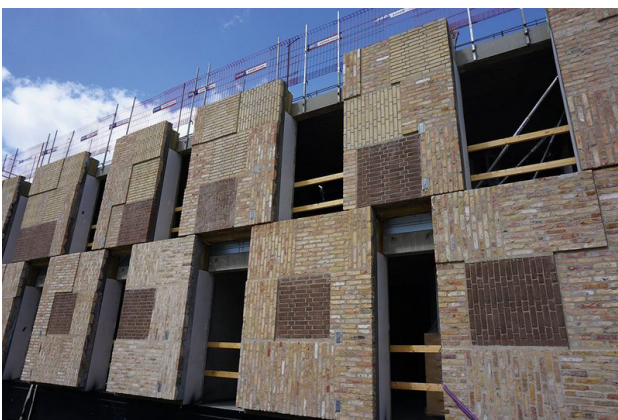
Prefabricated façade components with concrete and insulation (Lendager, 2019)
